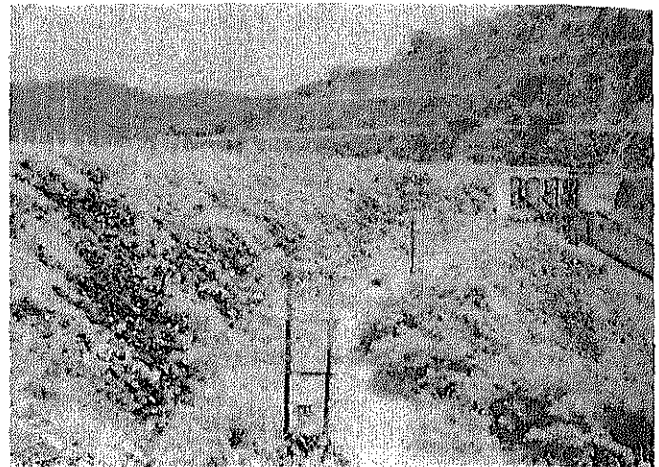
Conditions of the downstream slope-face of the Binga Dam
